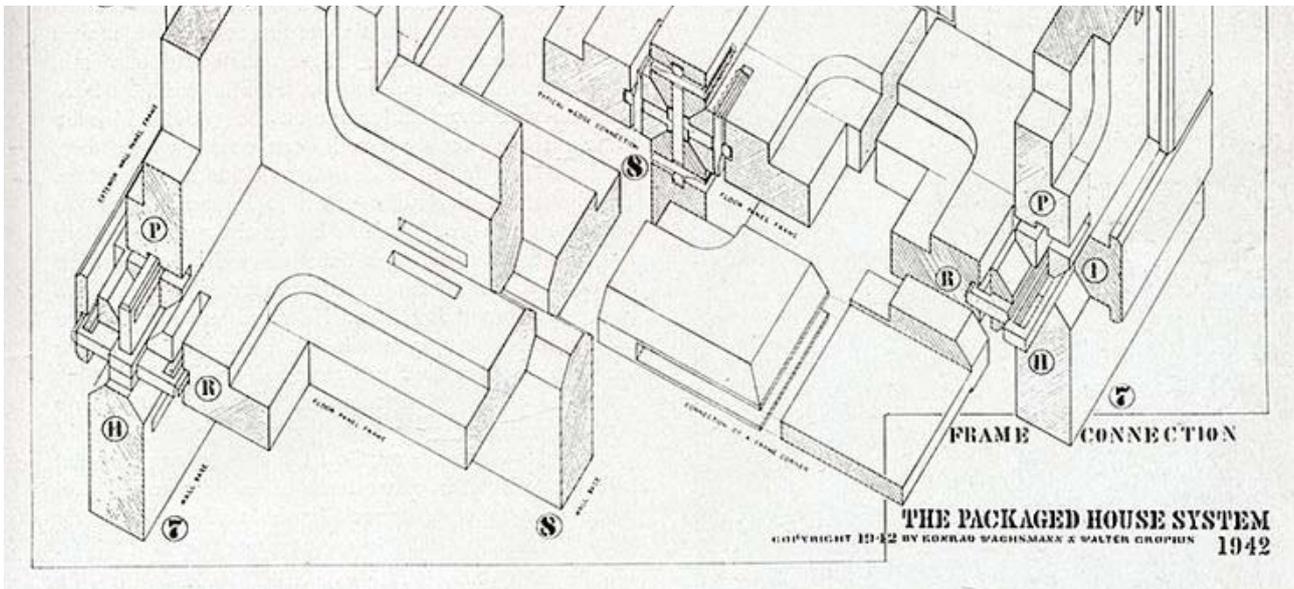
The Packaged House System. Connection detail. 1942
